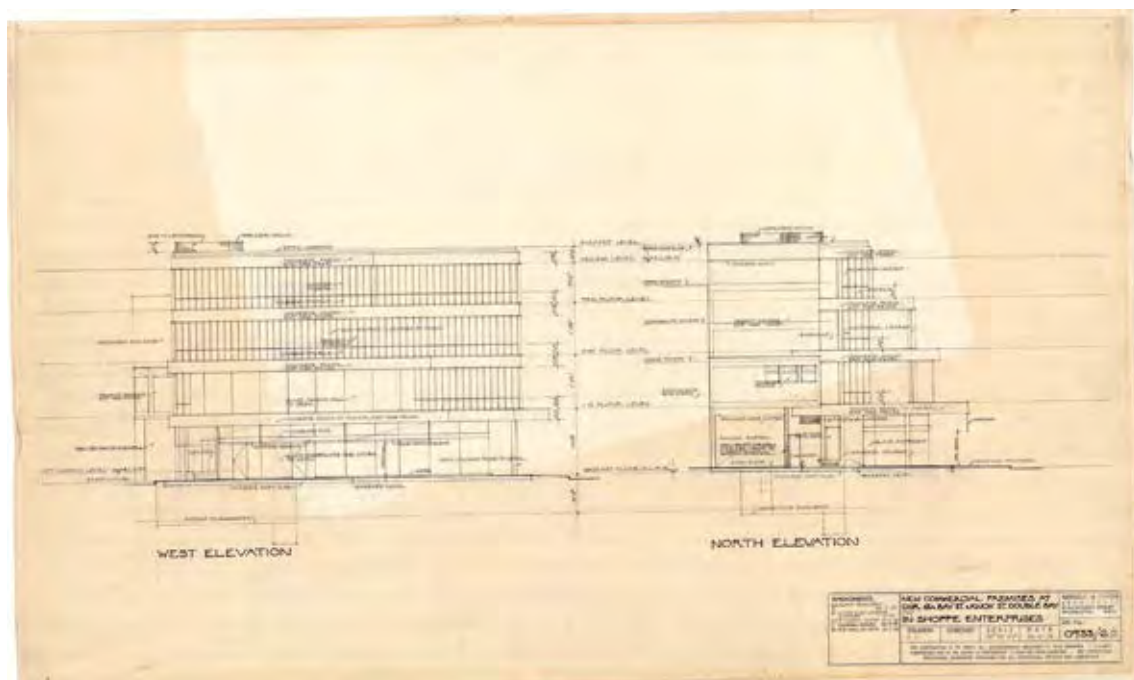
| North and west elevations of the Gergely & Pinter revisions. The third floor roof canopy was deleted, changing the apparent form of the facades. The north elevation of the revised scheme is more similar to the Gruzman design than what is there today, after numerous changes. (Source: Gergely & Pinter)
